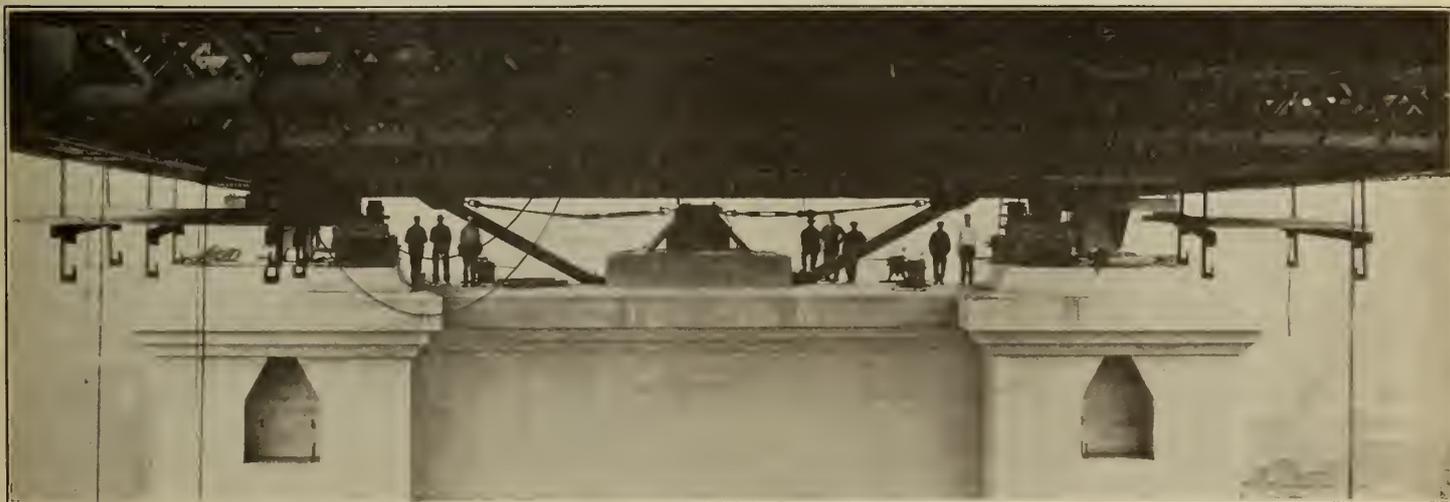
Main Span, North Side—General Arrangement at Anchor Pier while jacking Anchor Arm for Connection to Anchorage.
